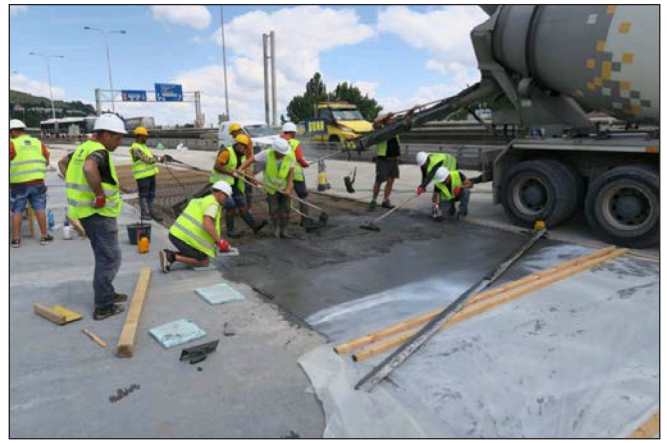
Pouring of UHPC on the bridge deck and immediate curing
